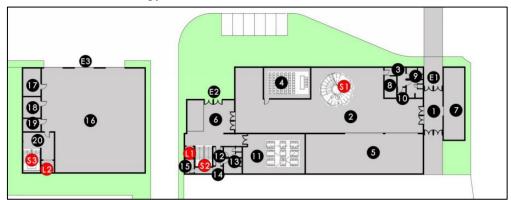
Re-drawn ground floor plan (Source: CREW - Cremonesi Workshop (2015)).
